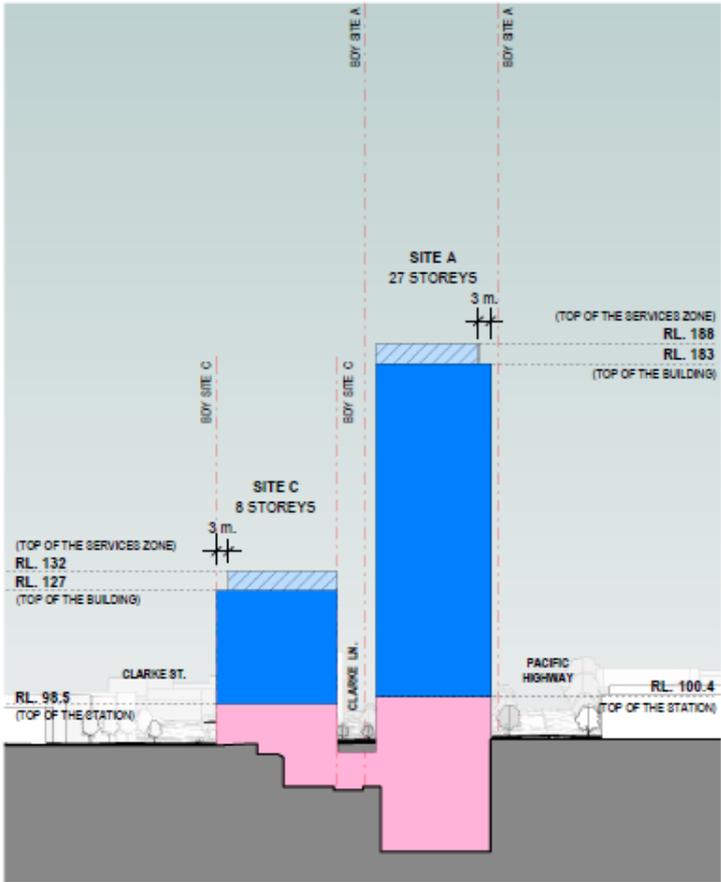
B: Proposed Crows Nest OSD building envelopes – cross section through the site (east-west)
